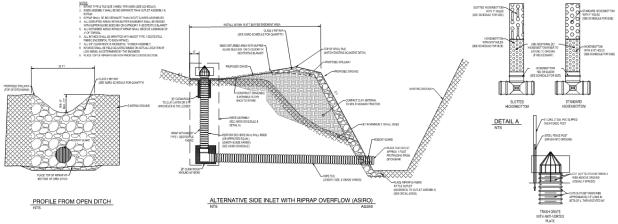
Detail of Alternative Side Inlet with Riprap Overflow
